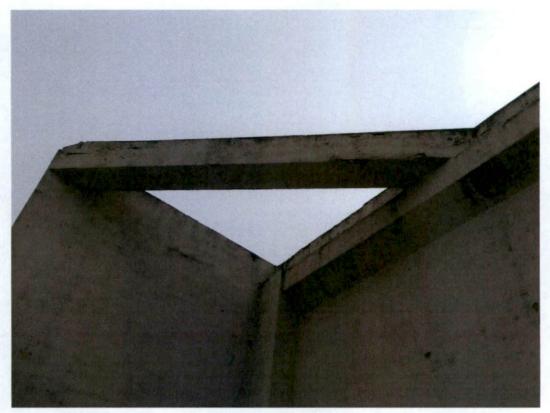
Cracks to parapet wall, lateral bracing at original sign location - Roof.
